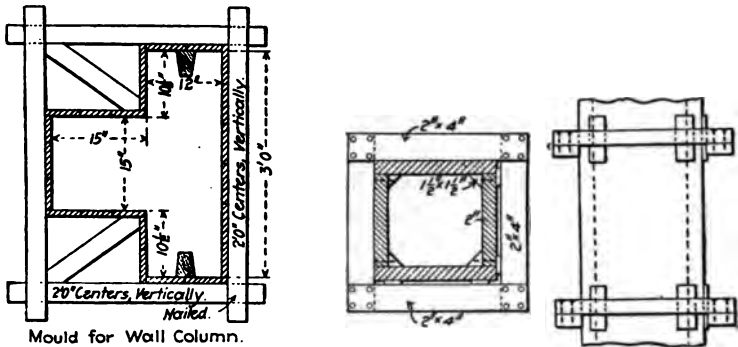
T-shaped Column Form, Parkville Sub-station, Brooklyn Fig. 413.—Column Form for Atlantic City Hotel.
